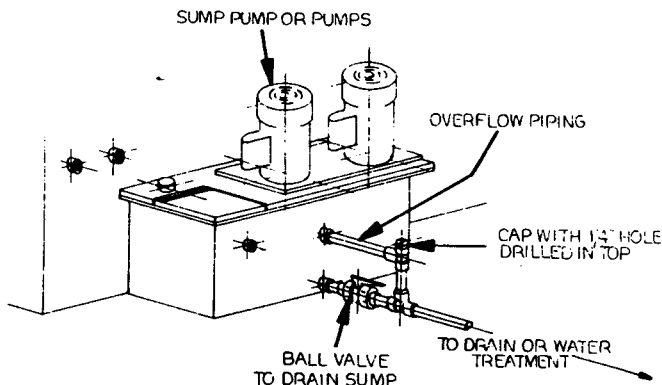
DRAIN AND OVERFLOW PIPING
